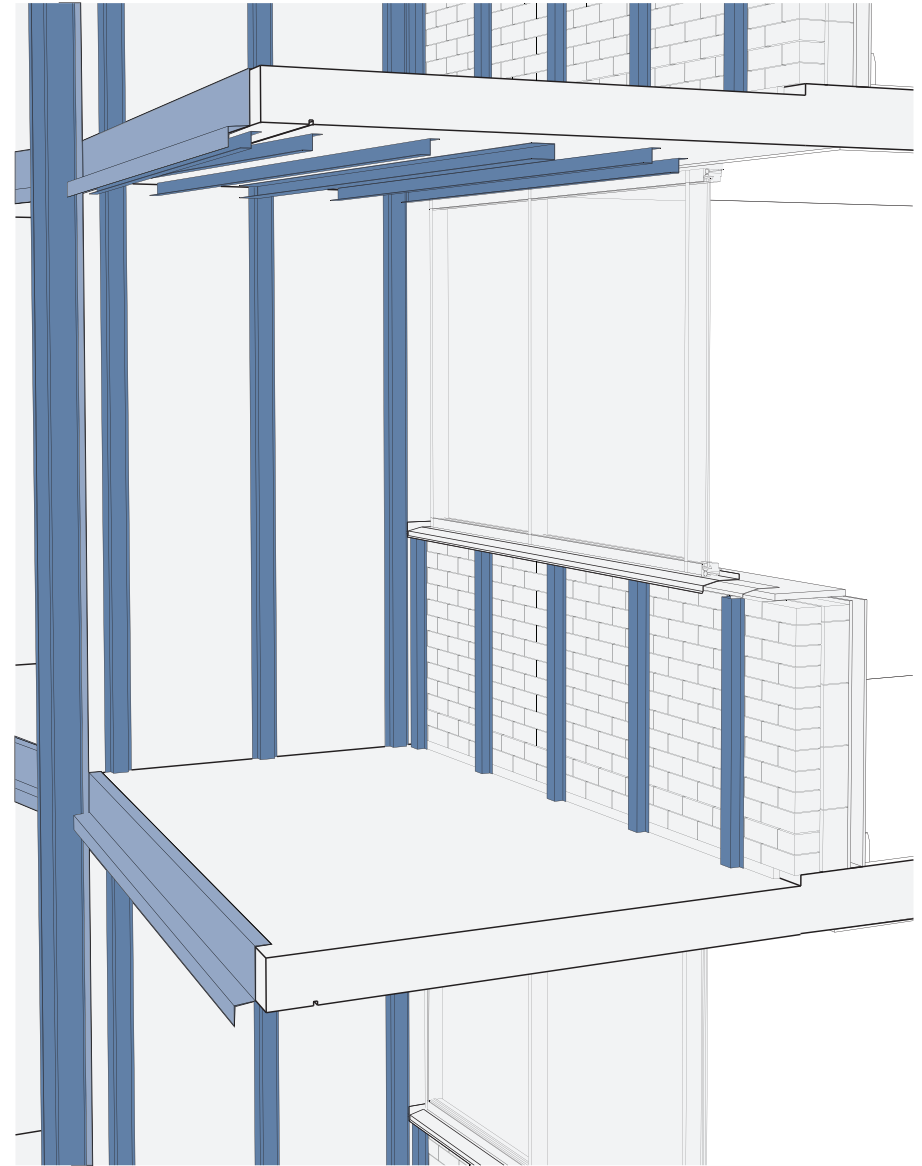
Girts and furring channels are mechanically fastened to the existing building envelope elements if a panel cladding interior finish is selected.
